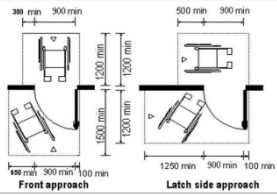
Manoeuvring space needed for wheelchair users to approach doors
